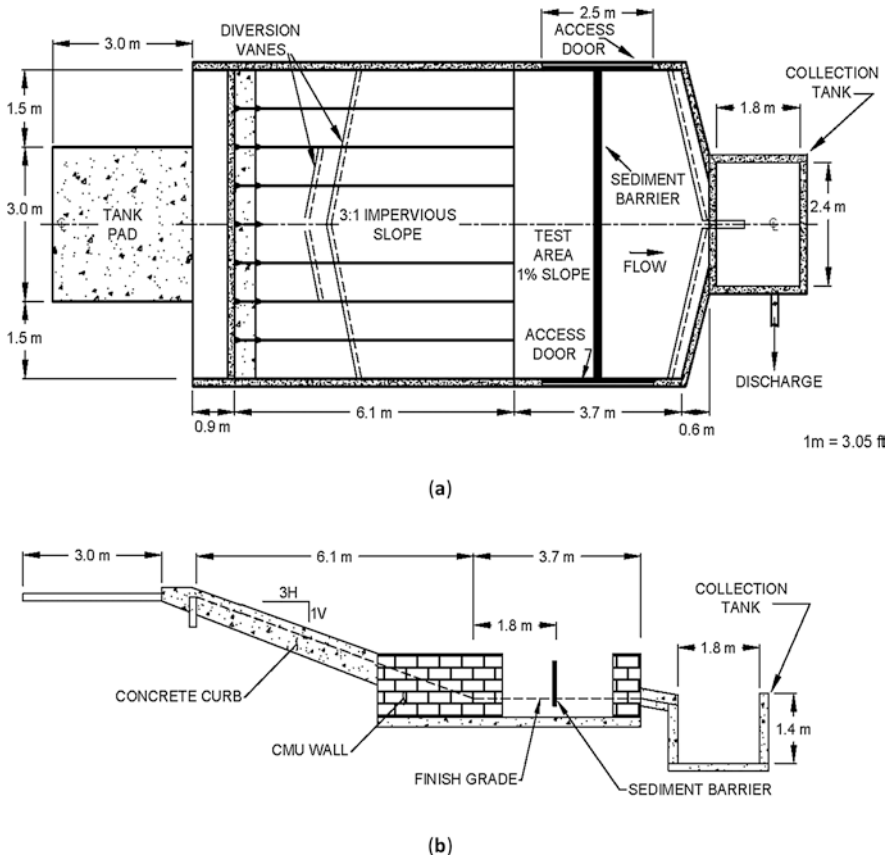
Plan and profile views of the test apparatus (Bugg et al., 2017). (a) Plan view, (b) profile view
